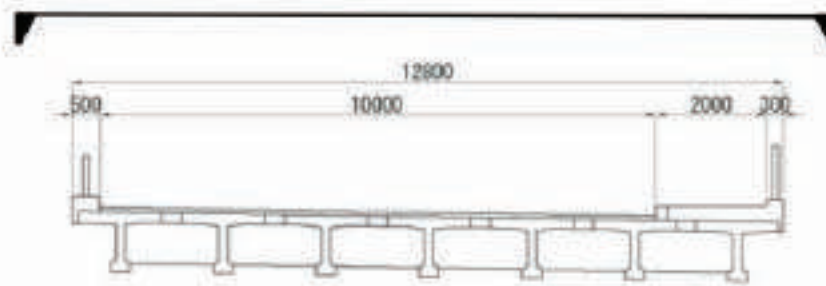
Point of View for Sketches of Superstructure or Deck Slab
